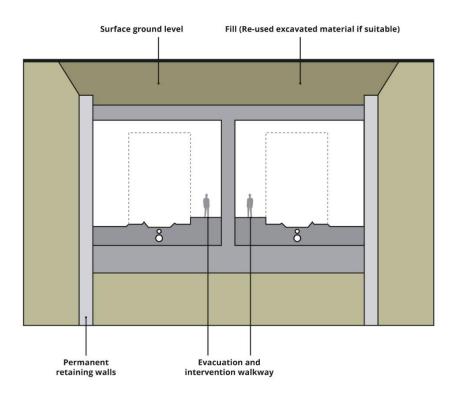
Cross-section of a generic cut-and-cover tunnel or box structure
